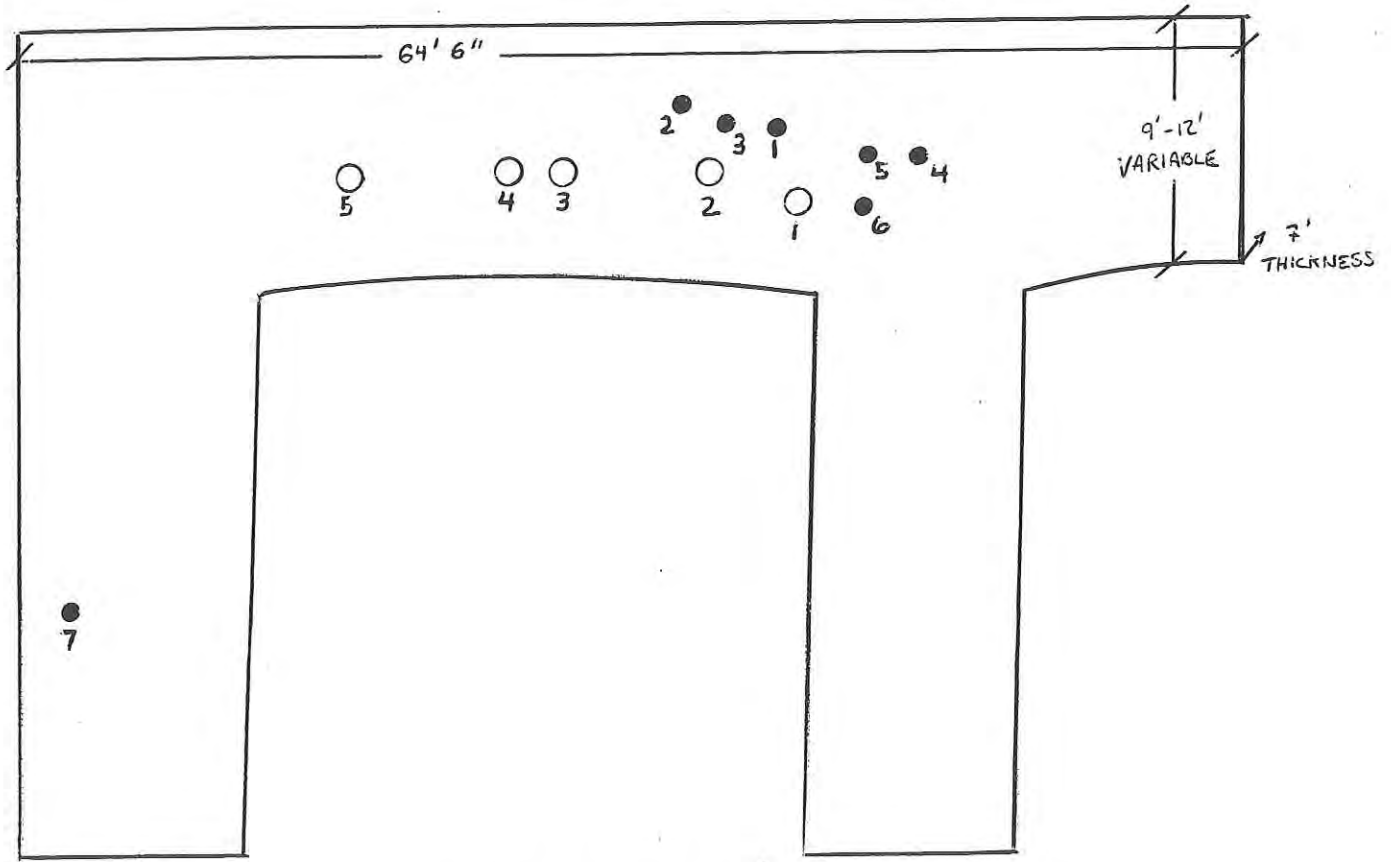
Plan view of coring locations for Pier Caps 38 and 39 NB and SB.
